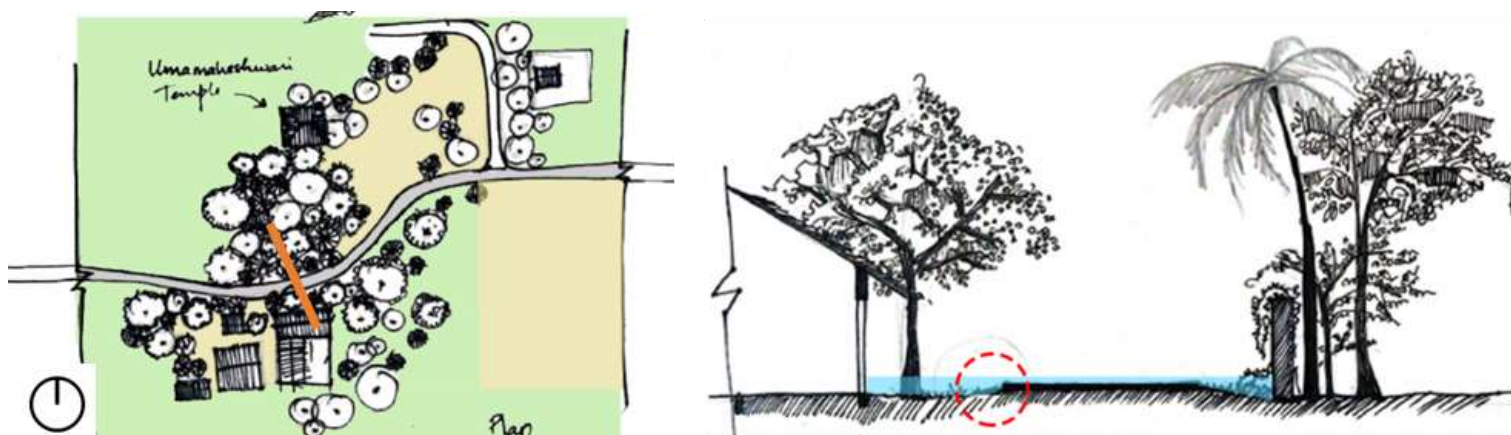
Detail at c on key plan Figure 8.11 The roads lack storm water drains facility, due to this there would be chances of flooding, no streetlights present, arterial roads become muddy which hampers the commute, The road shoulders are not well defined one
